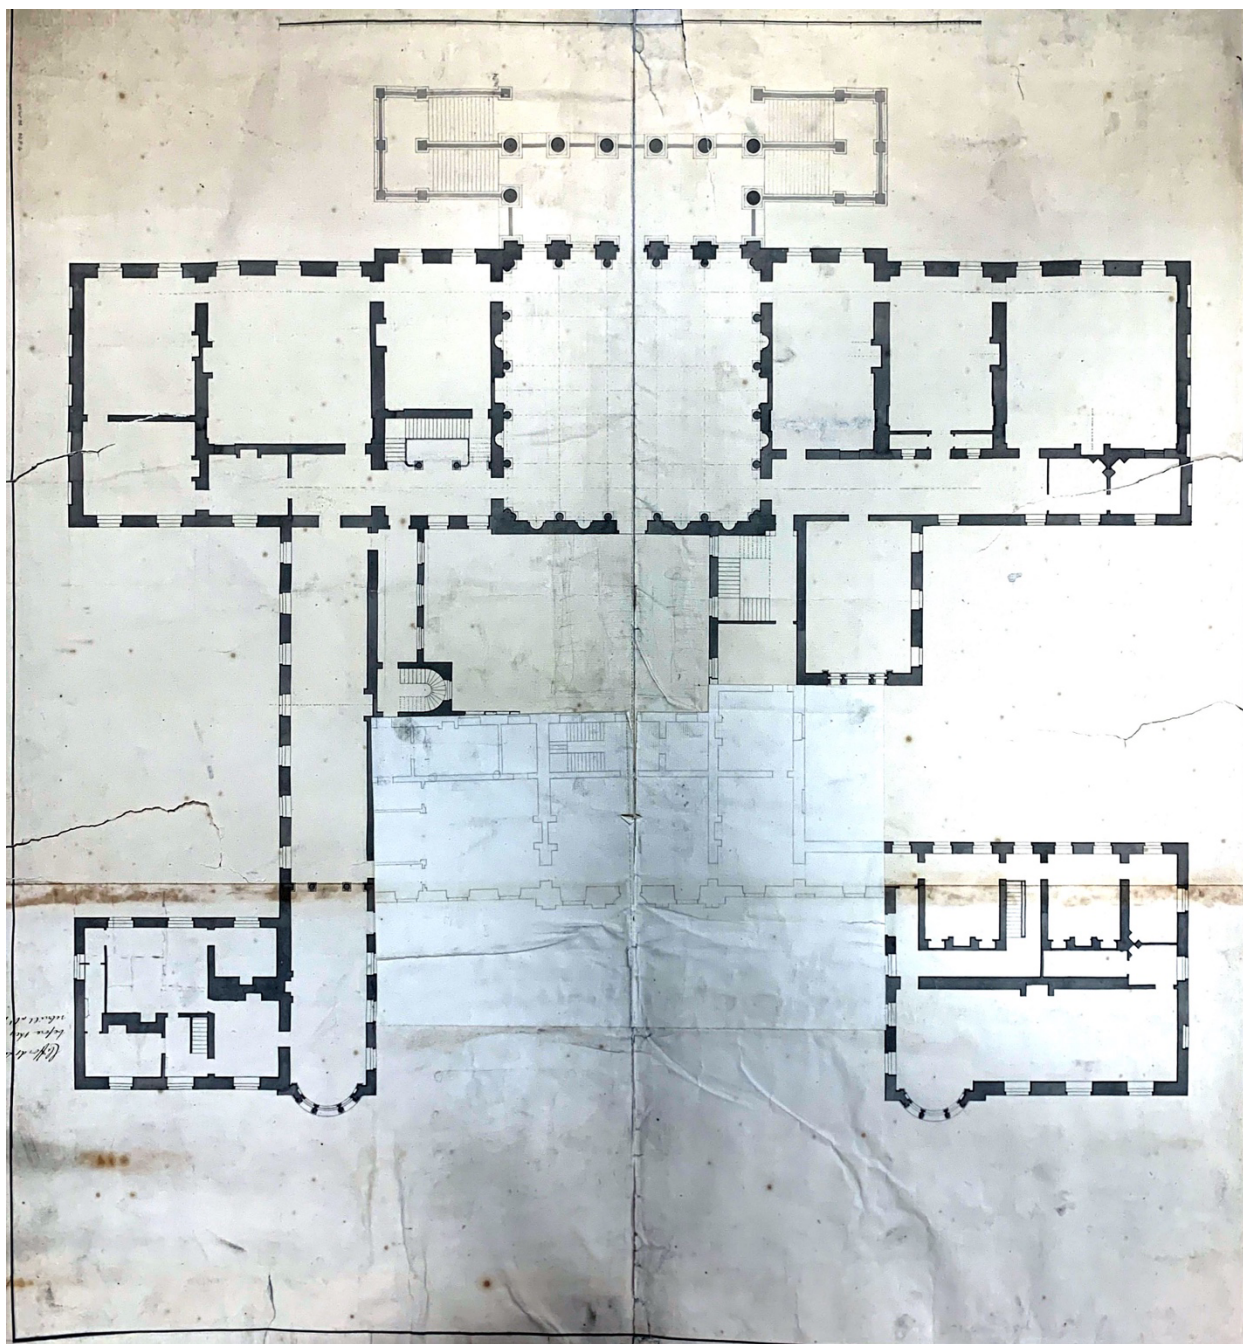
Plan of the main floor at Wentworth, with two alternative staircase designs, John Carr (?); endorsed by Lord Rockingham: "Plan of the Stair Case etc. etc., as it now is towards the Garden Front," n.d. WWM MP 4.
